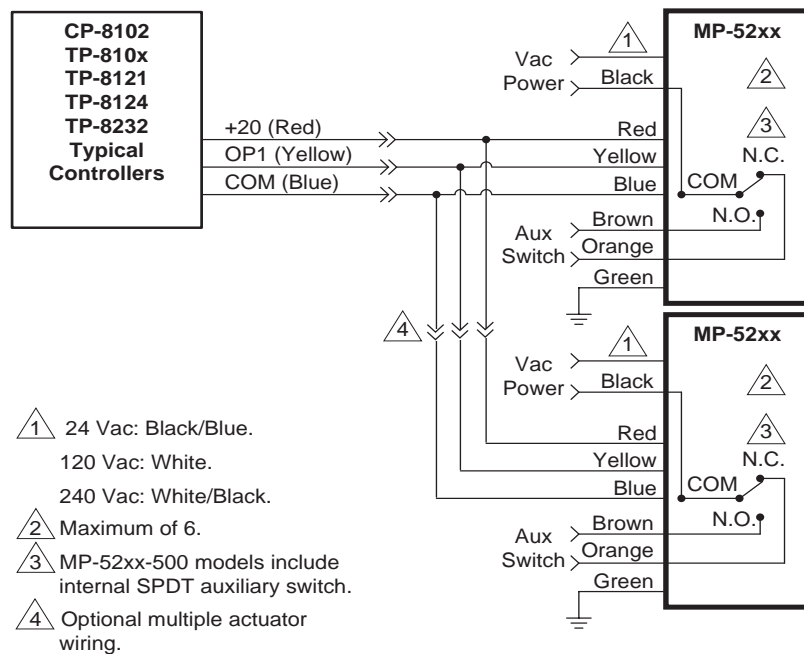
Typical Control Wiring for up to Six MP-52xx Series Actuators to Controllers Requiring External 20 Vdc Power Supply.
